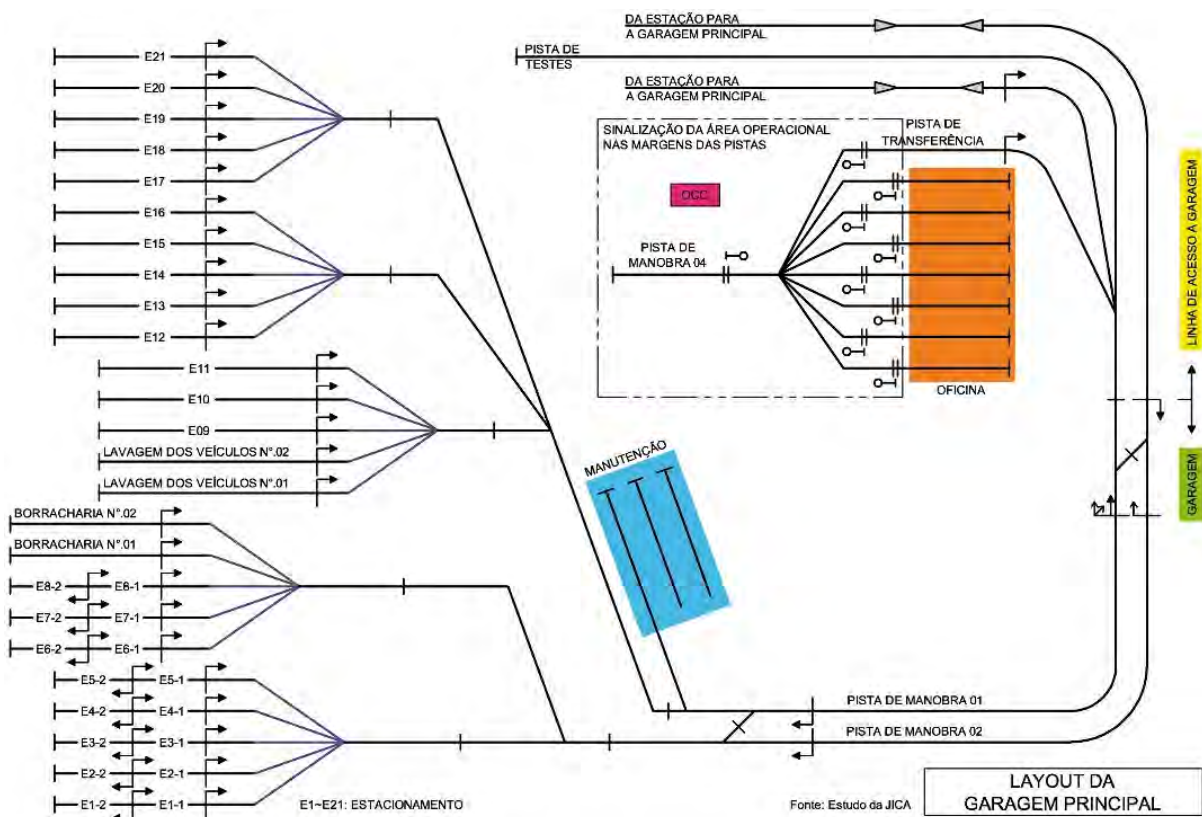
Track Layout and Signaling Arrangement of Jardim Angela Yard
